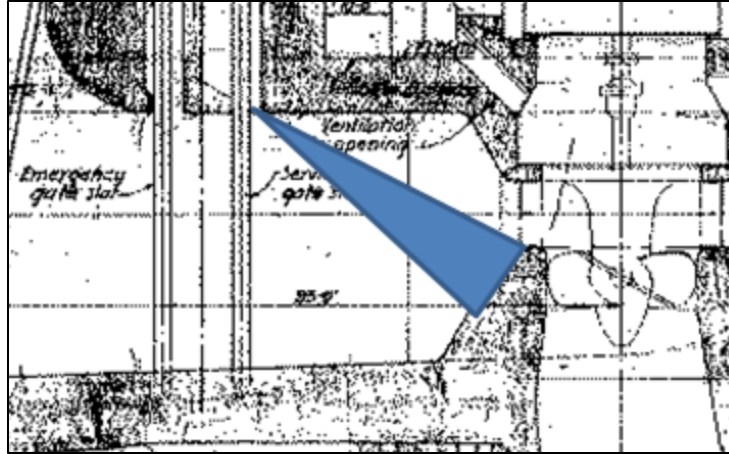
Example of single-beam transducer mount that could be used at spill bays.
